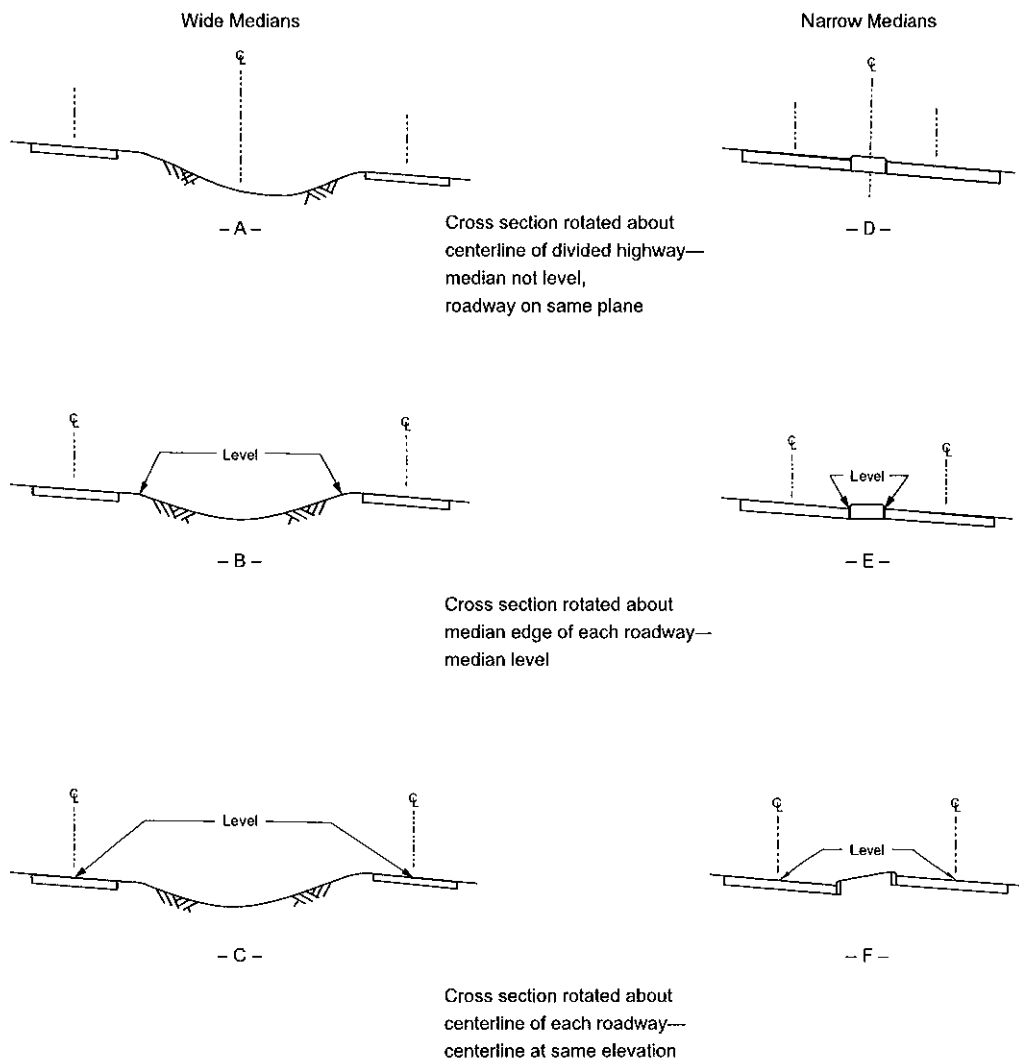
Methods of Attaining Superelevation on Divided Arterials in Rural Areas
